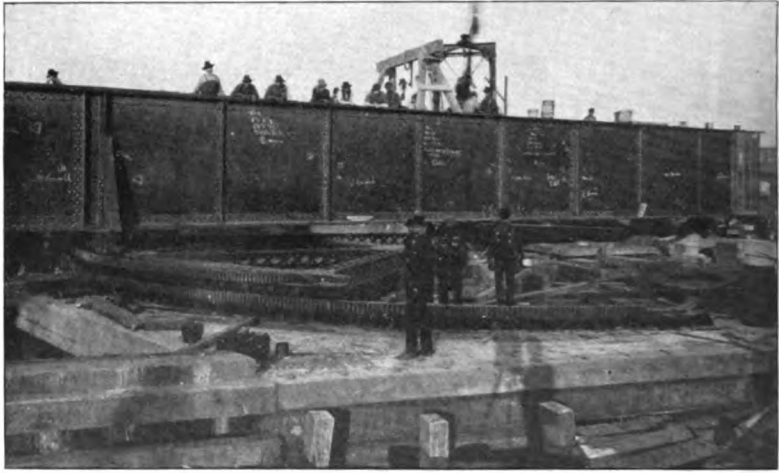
Shows East End of Bridge and Mechanism to Swing it.
